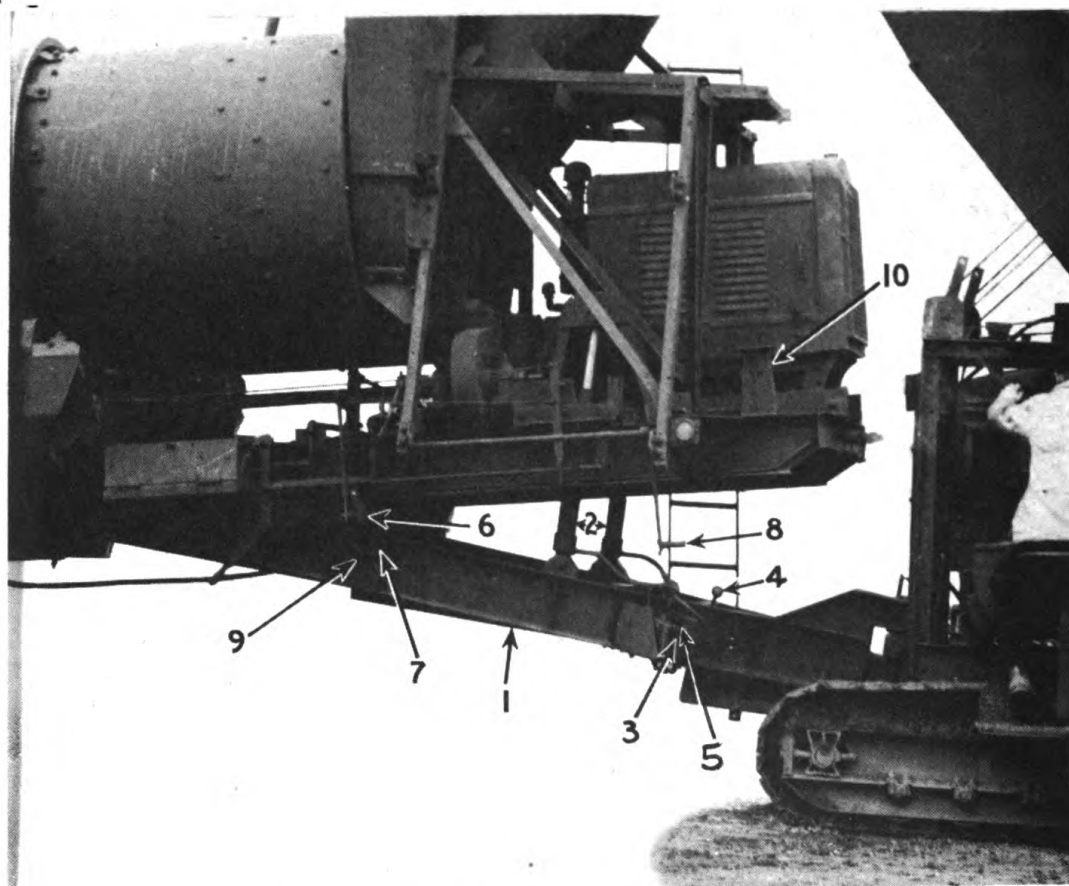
HYDRAULIC TOWING TONGUE ASSEMBLY.
